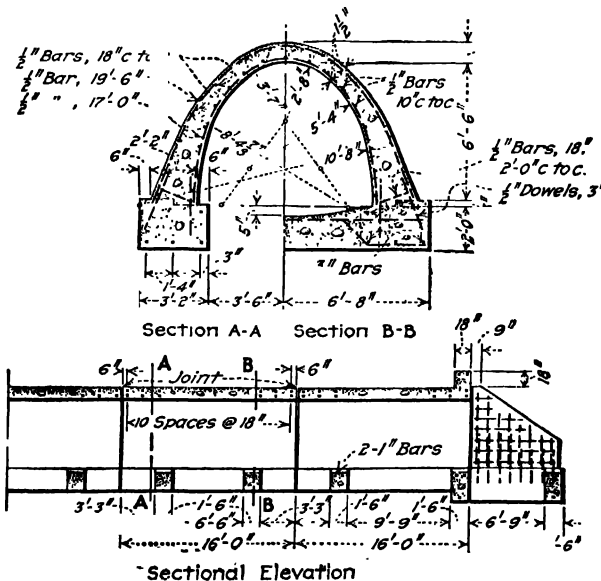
Standard design for 10-ft. arch culvert, State of Missouri Highway Department
